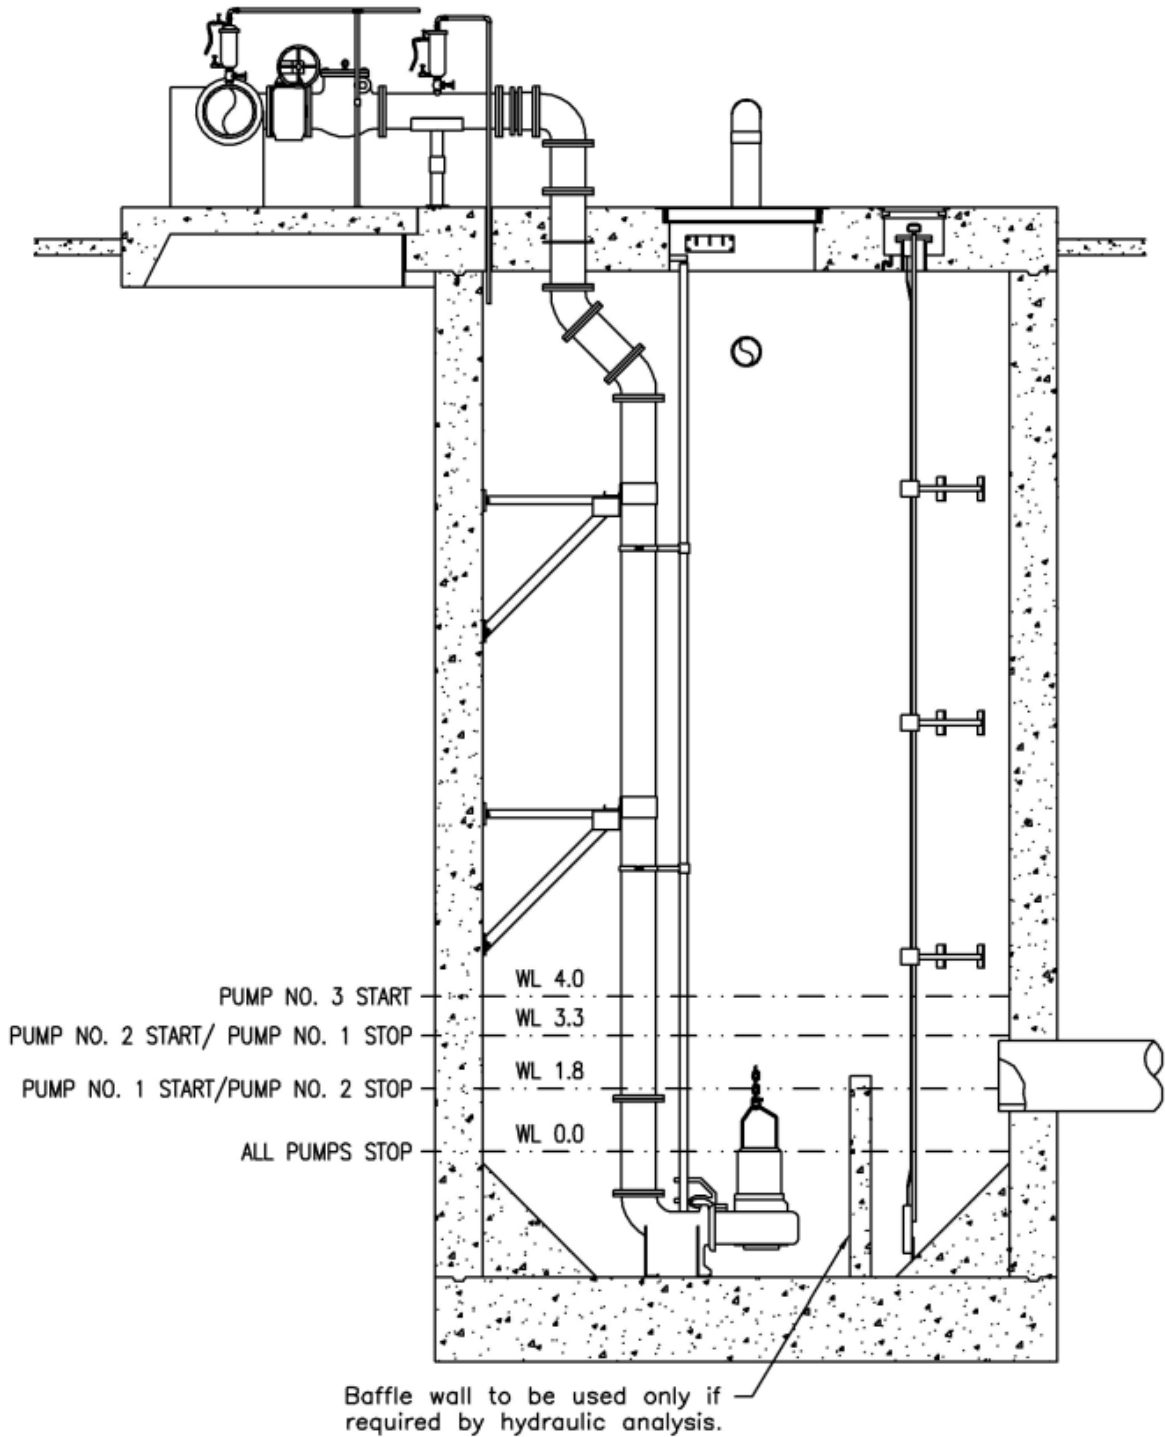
General elevation of a wastewater lift showing pump level controls. Note: influent pipe invert should be above "all pumps on" level.
